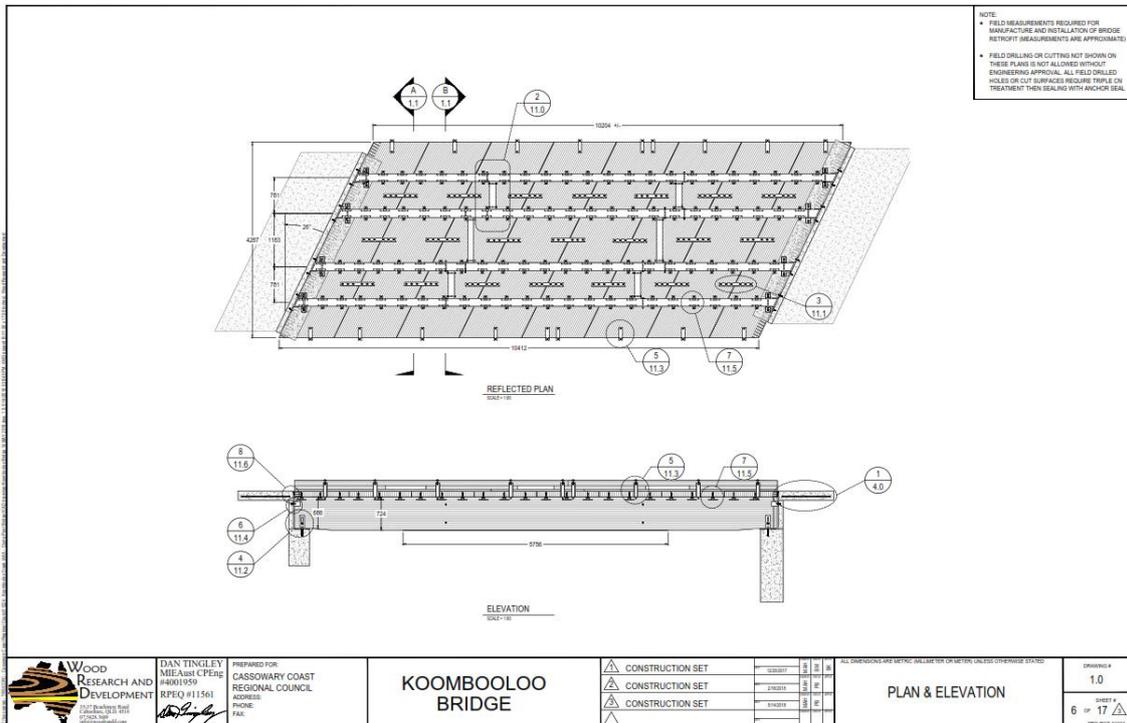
CAD drawing of Koombooloo Creek Bridge
